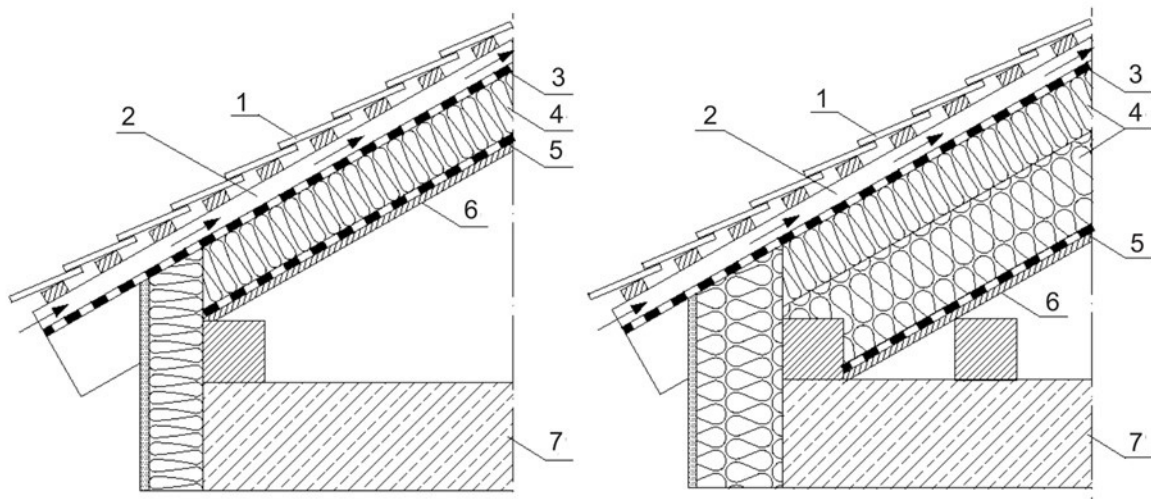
RETROFITTING A ROOF ABOVE AN ATTIC IN GENERAL USE: 1 – roofing (tiles), 2 – ventilation gap (2–3 cm wide), 3 – vapour-permeable film, 4 – thermal insulation, 5 – vapour-proof membrane (only in “wet” rooms), 6 – finish (e.g. wood), 7 – ceiling
